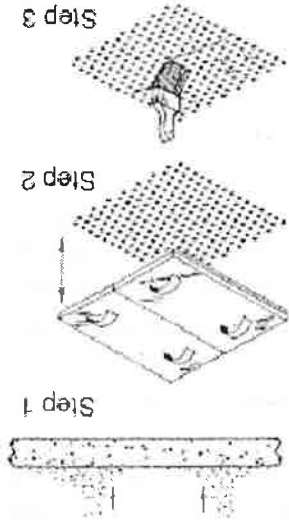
ONE PROCEDURE FOR PRODUCING STAMPED CONCRETE (INCRETE SYSTEMS).
